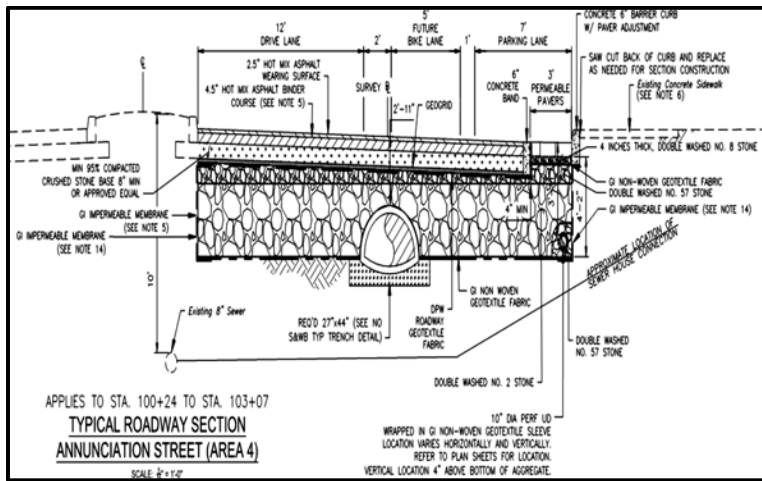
Annunciation Street at Race Street Cross-Section with Subsurface Storage
